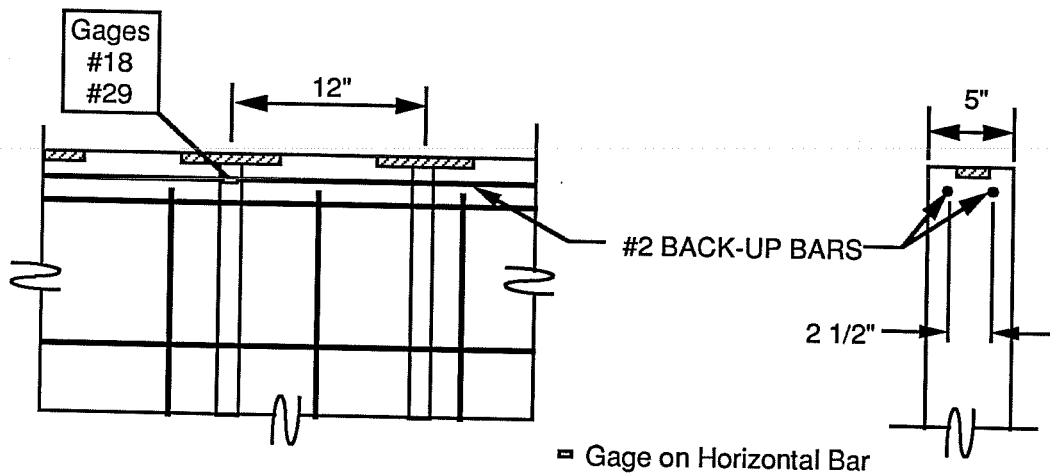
Slab #3 Detail @ Anchors K & L
